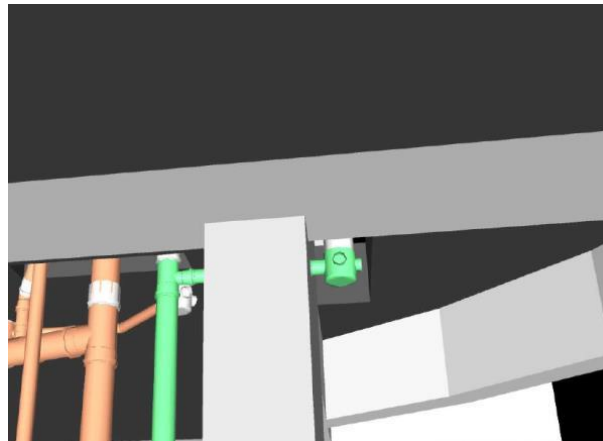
Interference between a facade column and a stormwater pipe. Source: the authors (2020)
